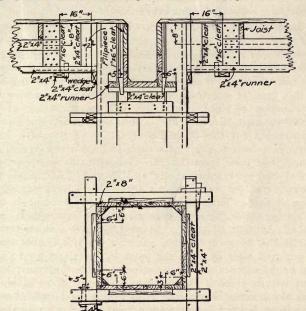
Forms for Girders, Beams, Slabs and Columns.
